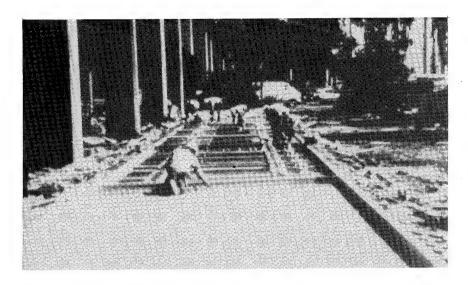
Panels for High Street Overhead were cast in right-of-way at jobsite
